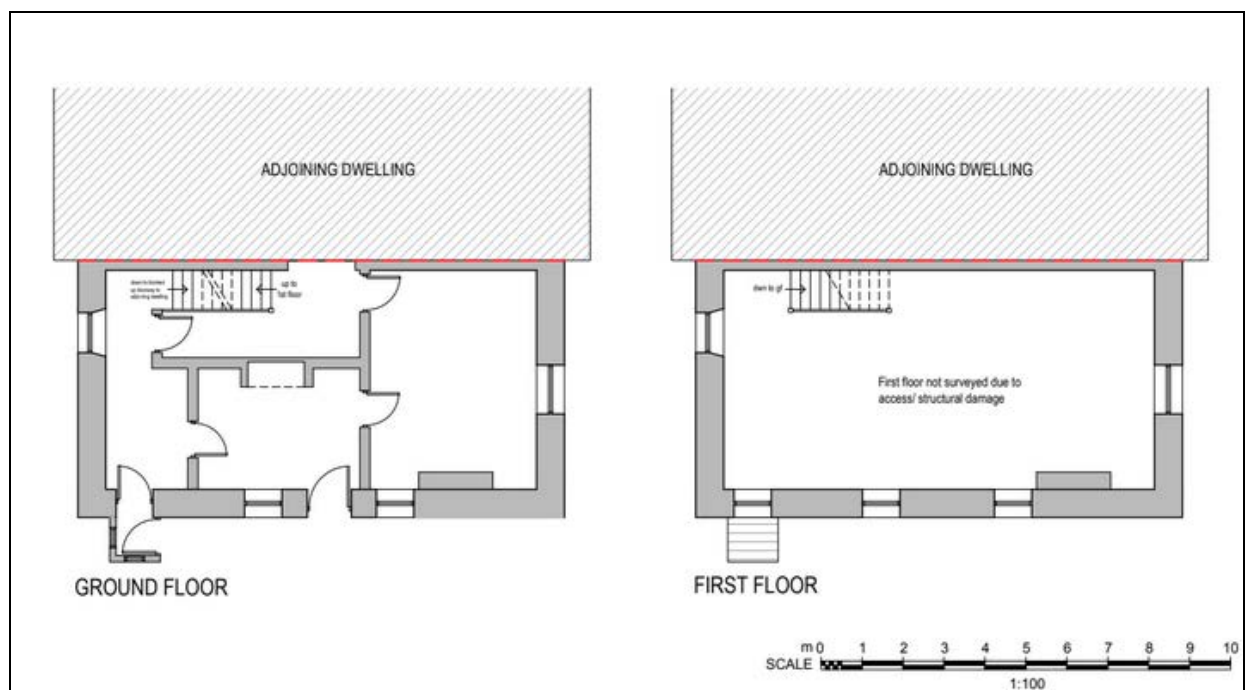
Floor plans of Woodlands as existing (Graham Anthony Associates)
